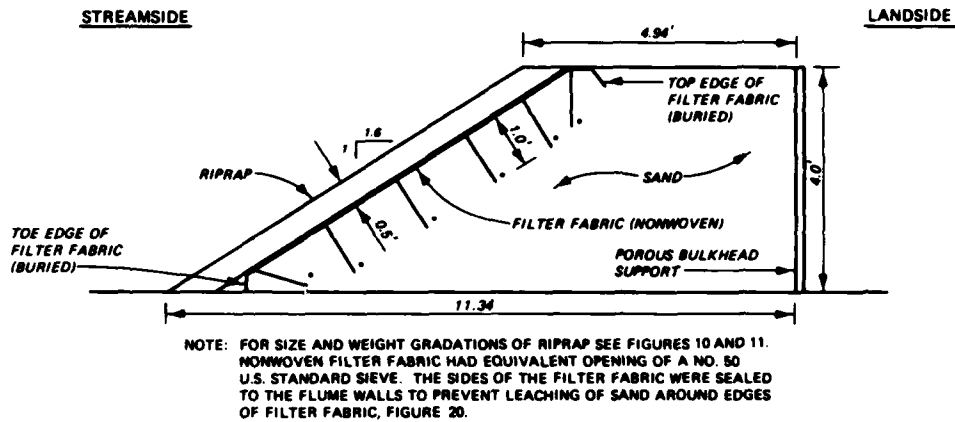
Plan 6, sand streambank with 0.5 ft of riprap and nonwoven filter fabric protection
